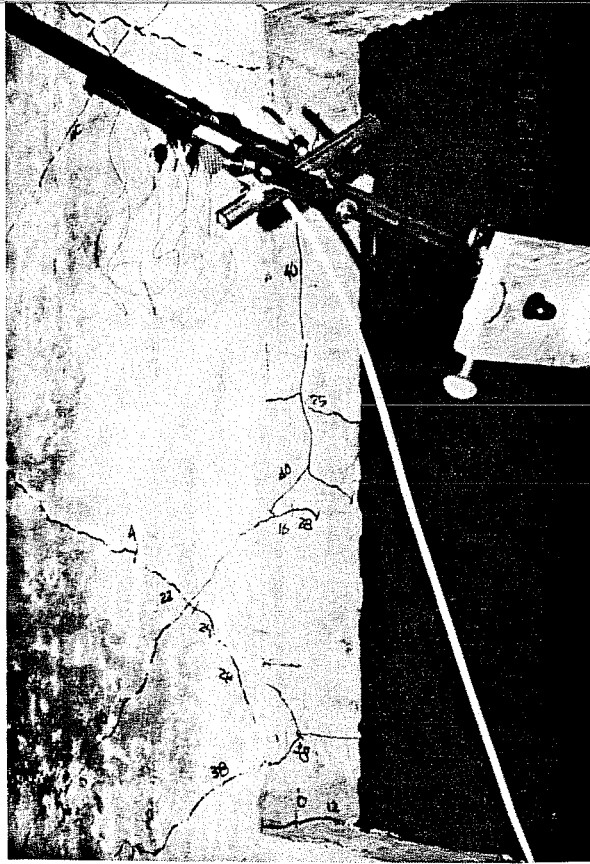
Wall Splitting in Window Opening, Cycles to 120 K
